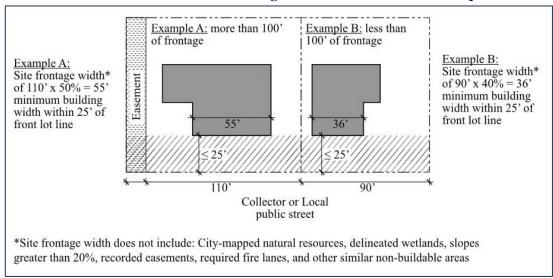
Maximum Building Setback - Street Orientation Option
